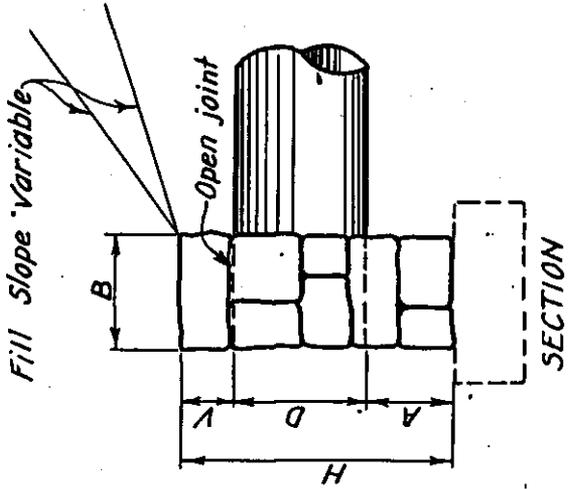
Paved ditching, walls, walks, and curbs specifications from 1934-35 construction drawings.
